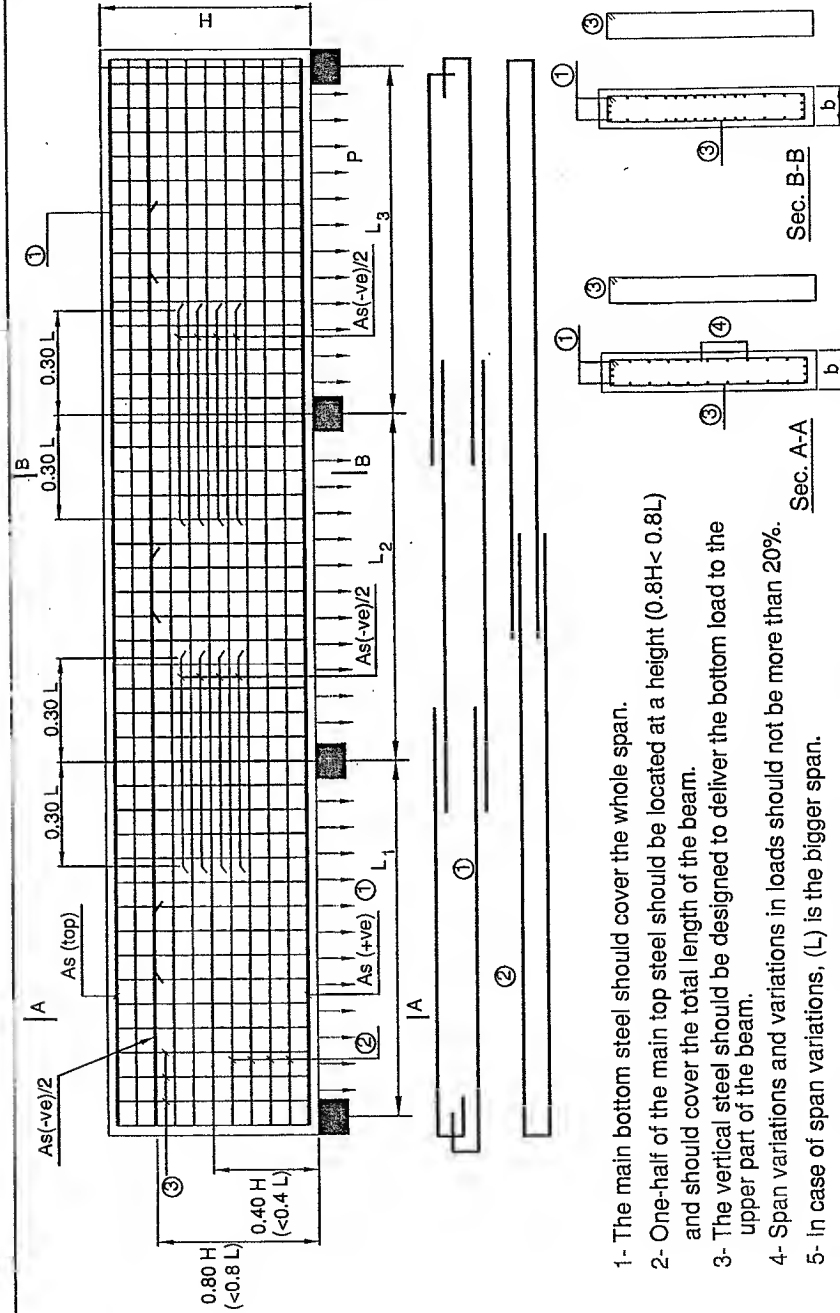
Reinforcement of a bottom-loaded continuous deep beam
